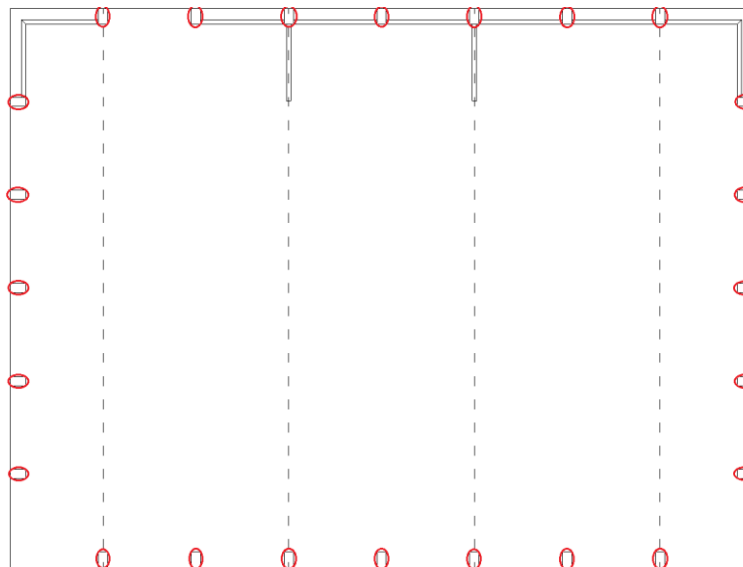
Location of columns that will be connected to floor and ceiling slabs
